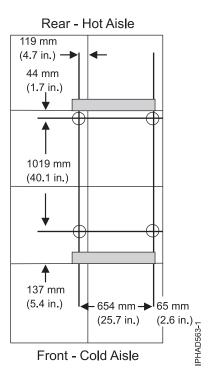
Rack tiedown hole pattern. Raised floor with 600 mm (23.6 in.) floor panels figure
